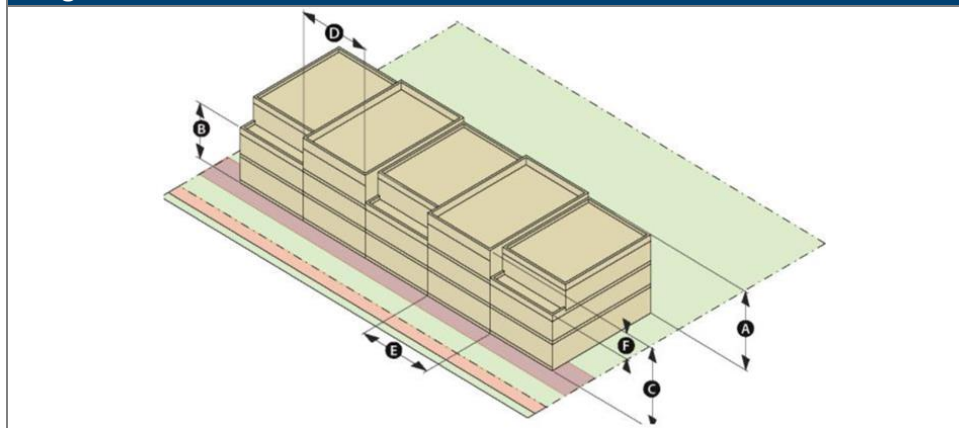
E: Illustrative Apartment Building Type Height and Floor Height
